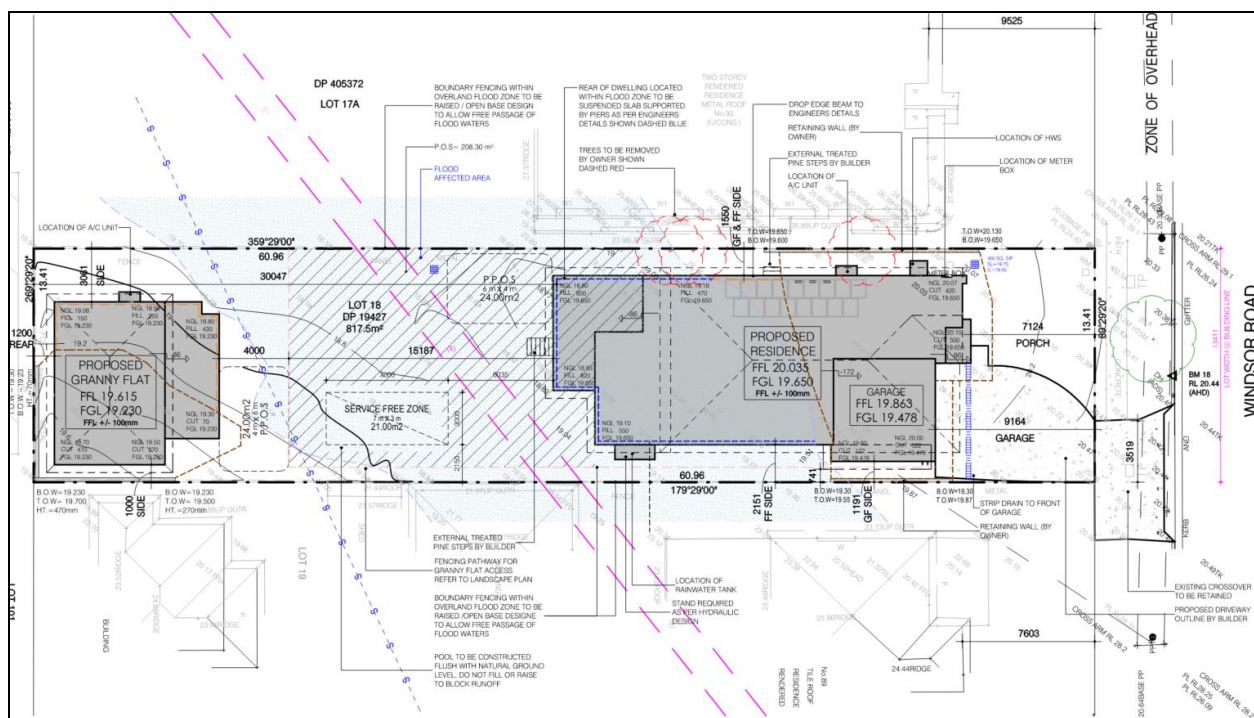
Proposed Site Plan (Source: Fowler Homes, 2026)
